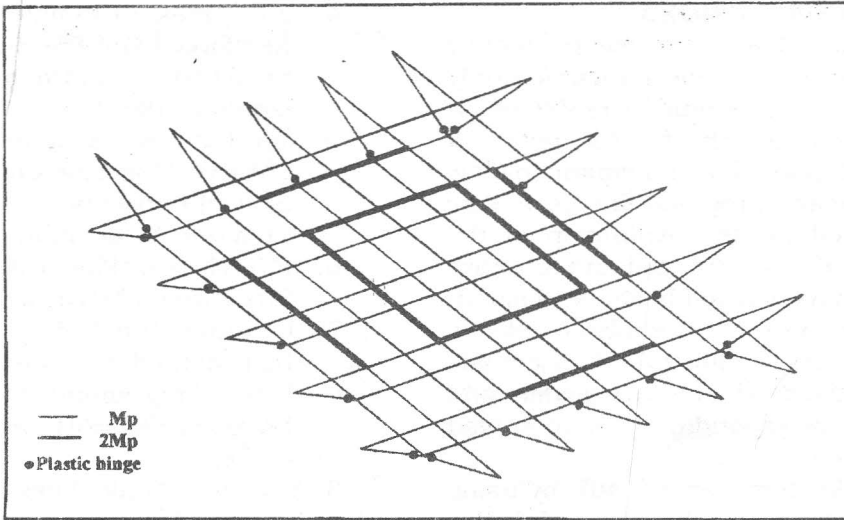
Mode of collapse of the floor (30% of the floor are reinforced)
